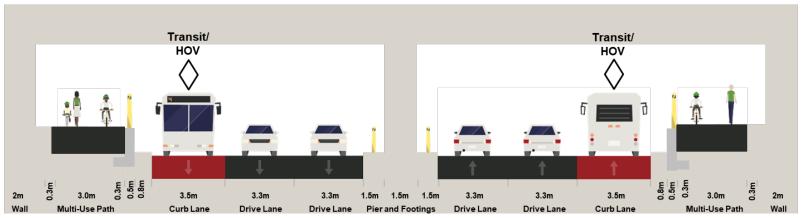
Alternative 2 - Underpass with AT Improvements
